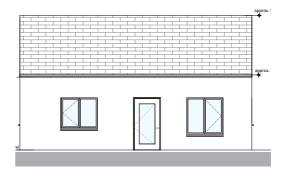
2-Bed Unit Rear Elevation (not to scale)
